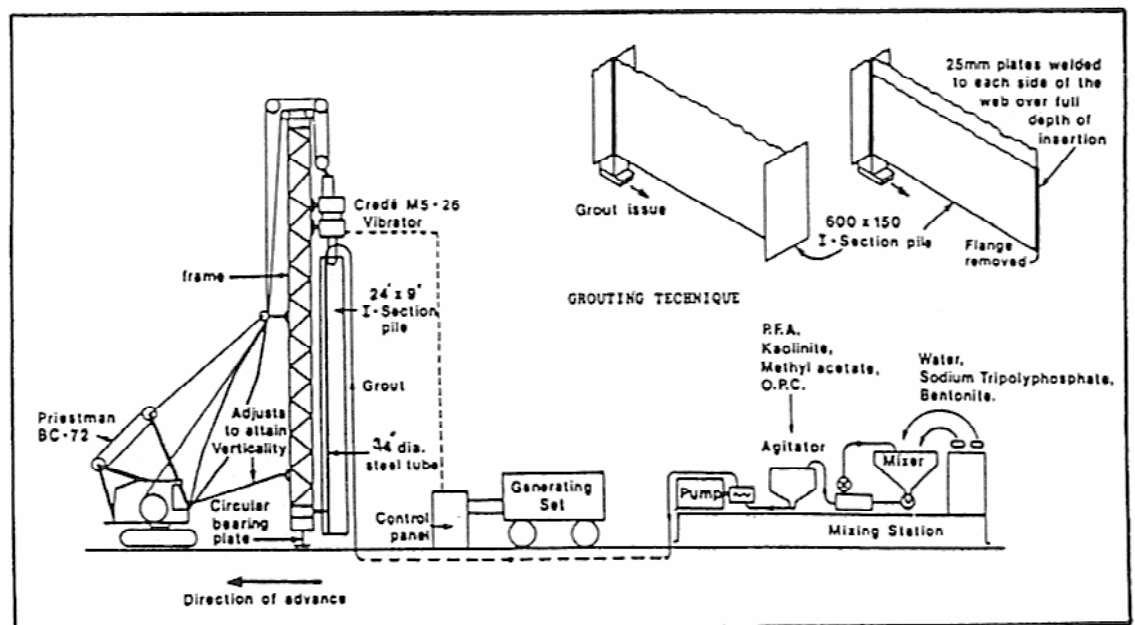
Schematic view of grouting equipment, Banbury Dam (45)
